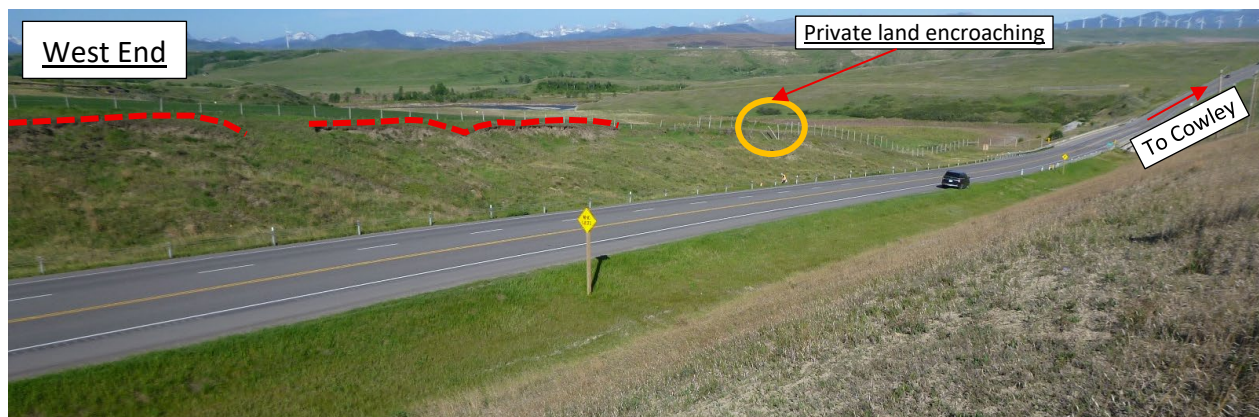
HTCB installed between the 2023 and 2025 inspections, south (eastbound) ditch, and head scarp (red dashed line). Ditch and back slope are well vegetated. Photo taken May 28, 2025, facing east.
